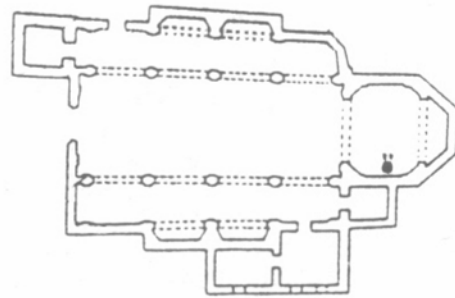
Plan of the church Santo Stefano a Cesclans.
